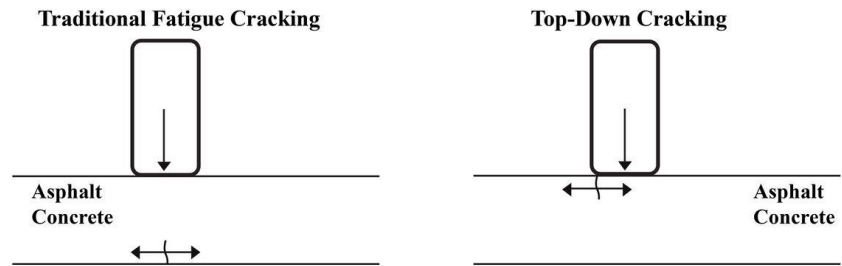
Traditional Fatigue and Top-Down Cracking of Asphalt Concrete
